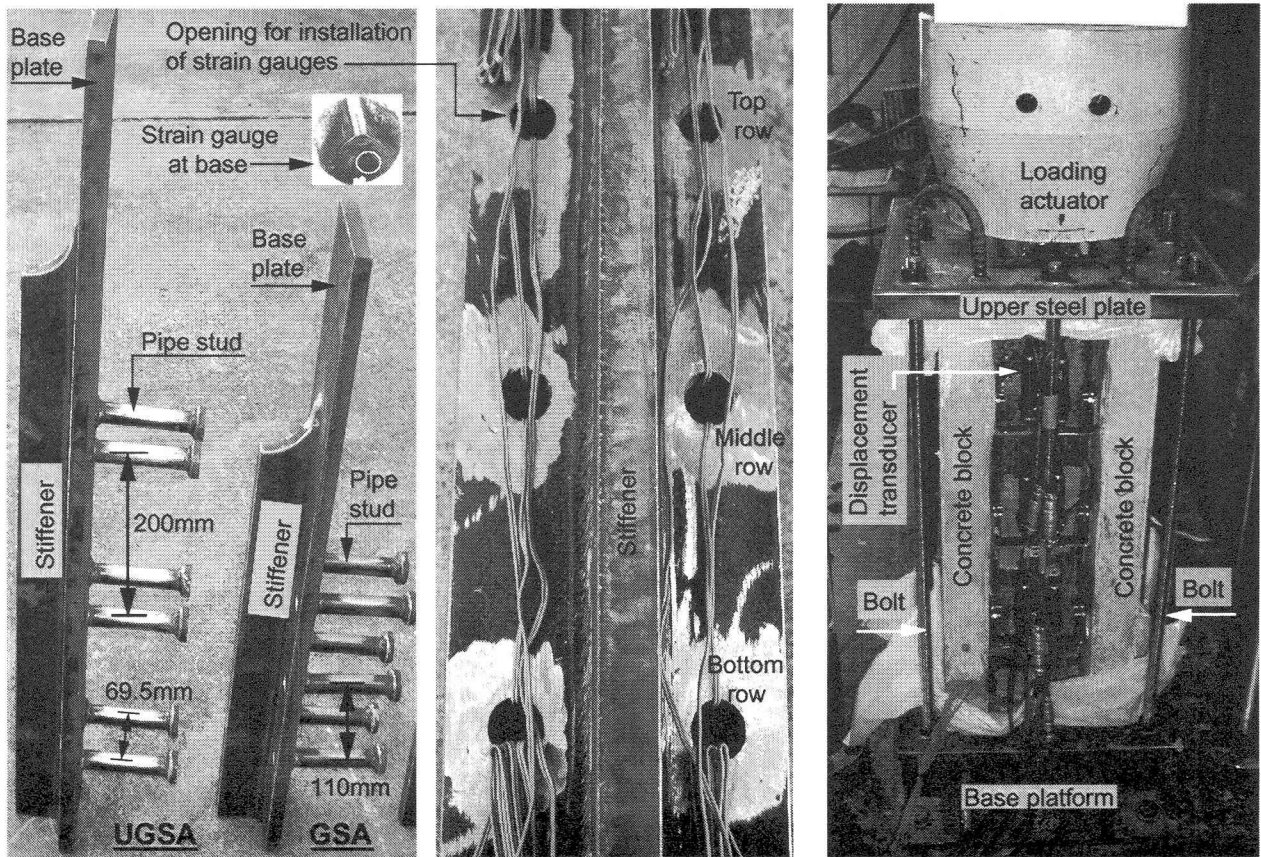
GSA & UGSA and opening at base plate for strain gauges Photo 2 Specimen under loading
